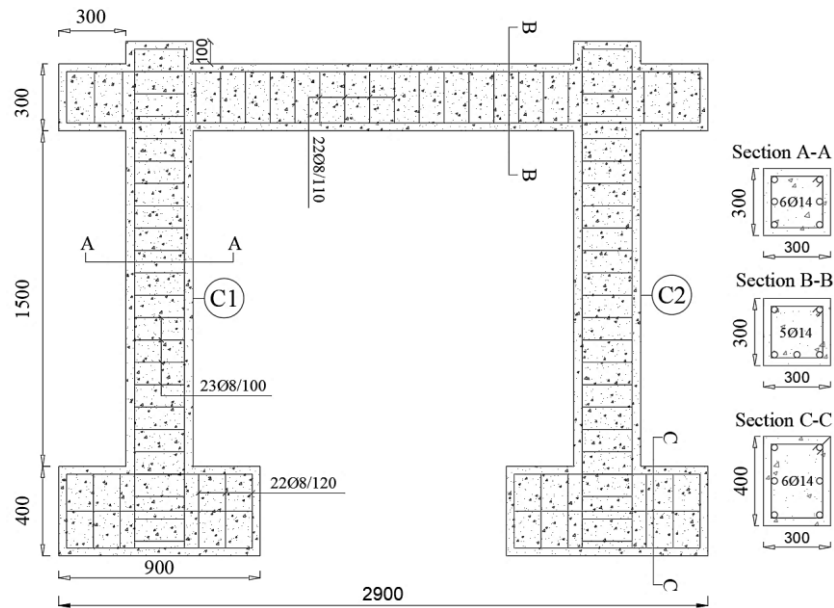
Section properties and detailing of reinforcement bar of the RC frame
